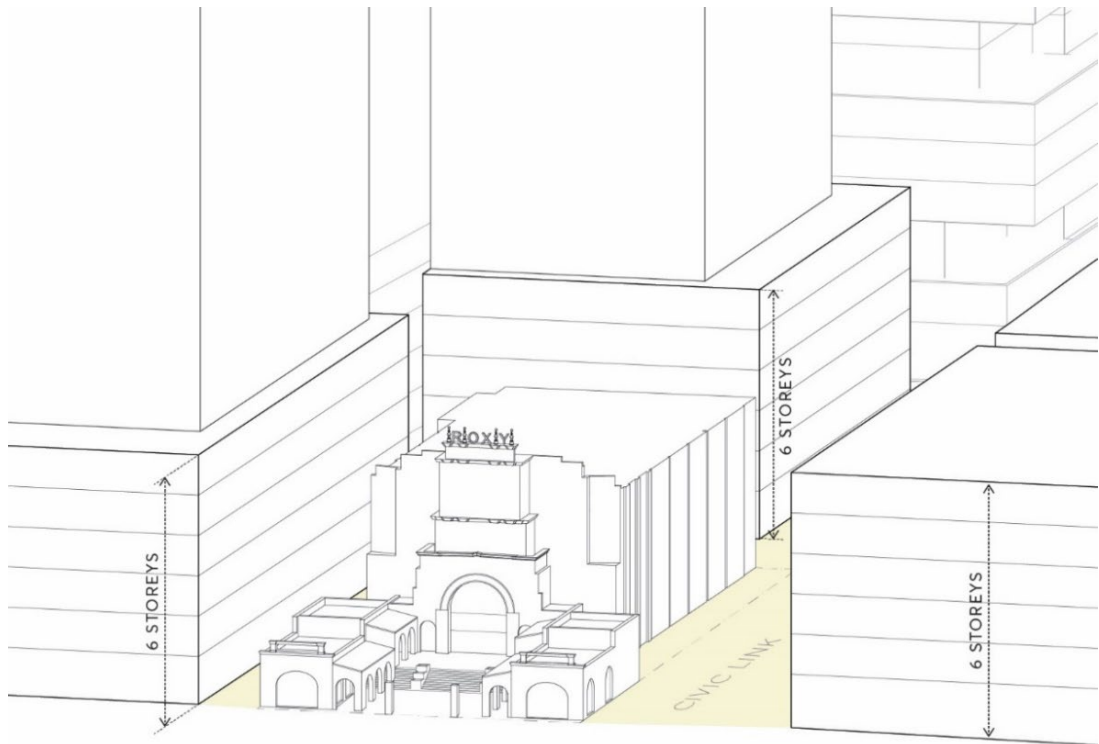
Street Wall Heights next to the Roxy
